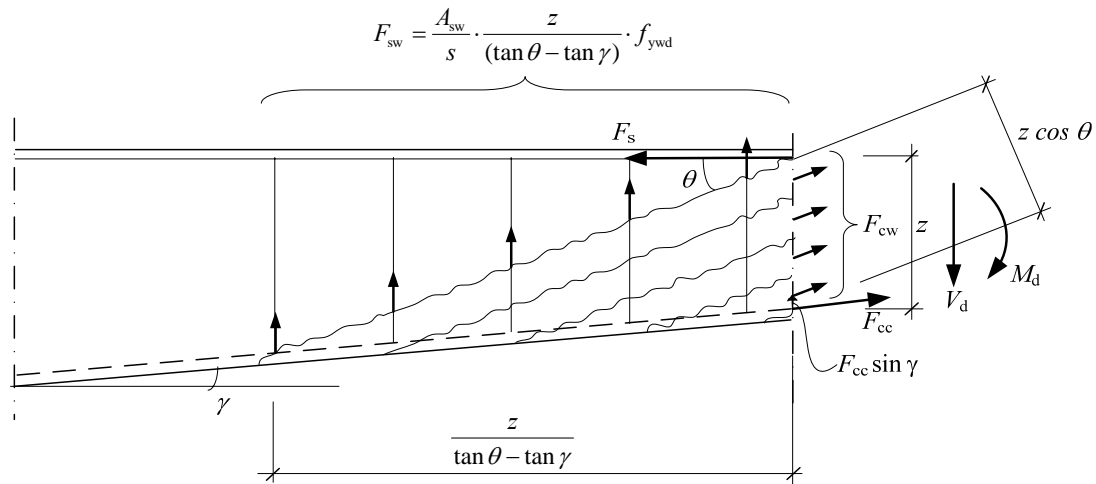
Truss model with inclined compressive chord, vertical shear reinforcement and variable angle of strut inclination.
